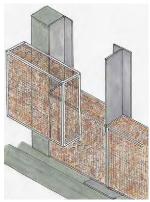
Structured Wall System. Welded mesh stone-filled baskets are fixed to steel columns and concrete columns (see section 7, drawings A1 and 2).
